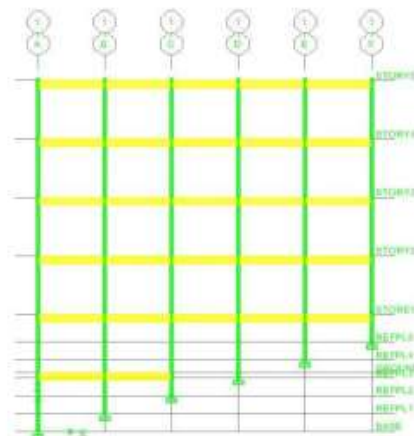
Elevation of step back building for five storey model (150 slope)
